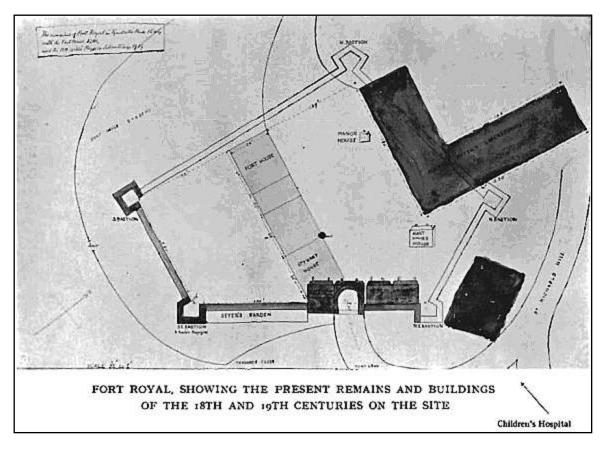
Parker's plan of the Royal Fort (Parker 1929, plate 3).
